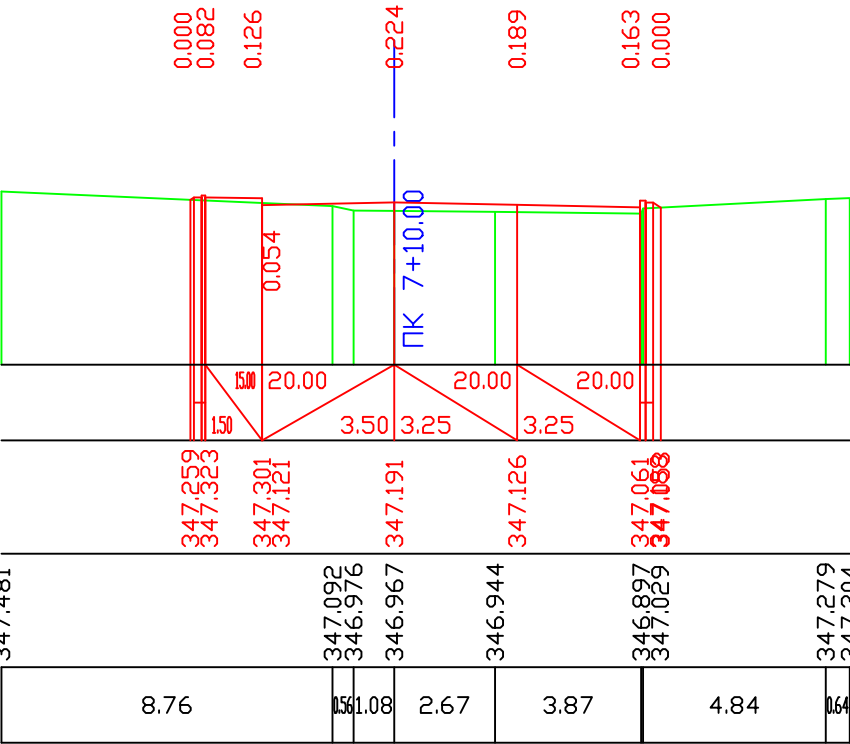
is a detailed cross-section diagram of a bridge deck. The diagram shows a multi-lane bridge with a central lane and two side lanes. Key dimensions and elevations are labeled. The central lane has a width of 7.00m and a height of 0.229m. The side lanes have widths of 3.25m and 3.50m. The total width of the bridge is 13.5m. The diagram also shows the bridge piers and the approach roads. The elevations of the bridge deck and the approach roads are given in meters above sea level (m.a.s.l.). The diagram is labeled with 'ПР. 7+00.00' and '0.229'.
